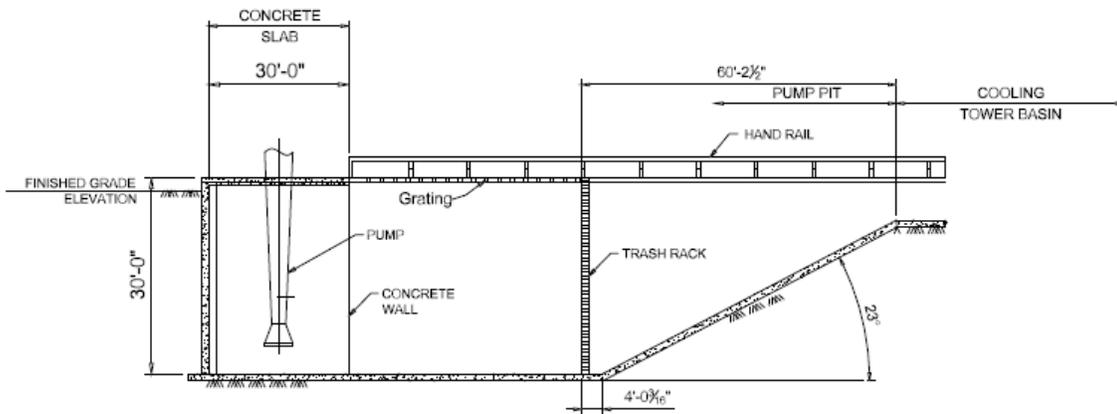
Proposed Circulating Water Pump Pit (SK-C-8)
